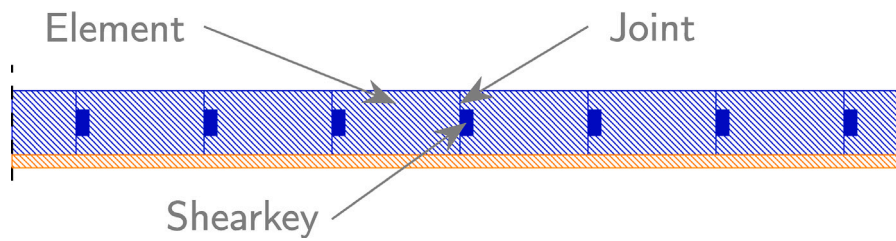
Typical longitudinal section of an immersed tunnel section.
